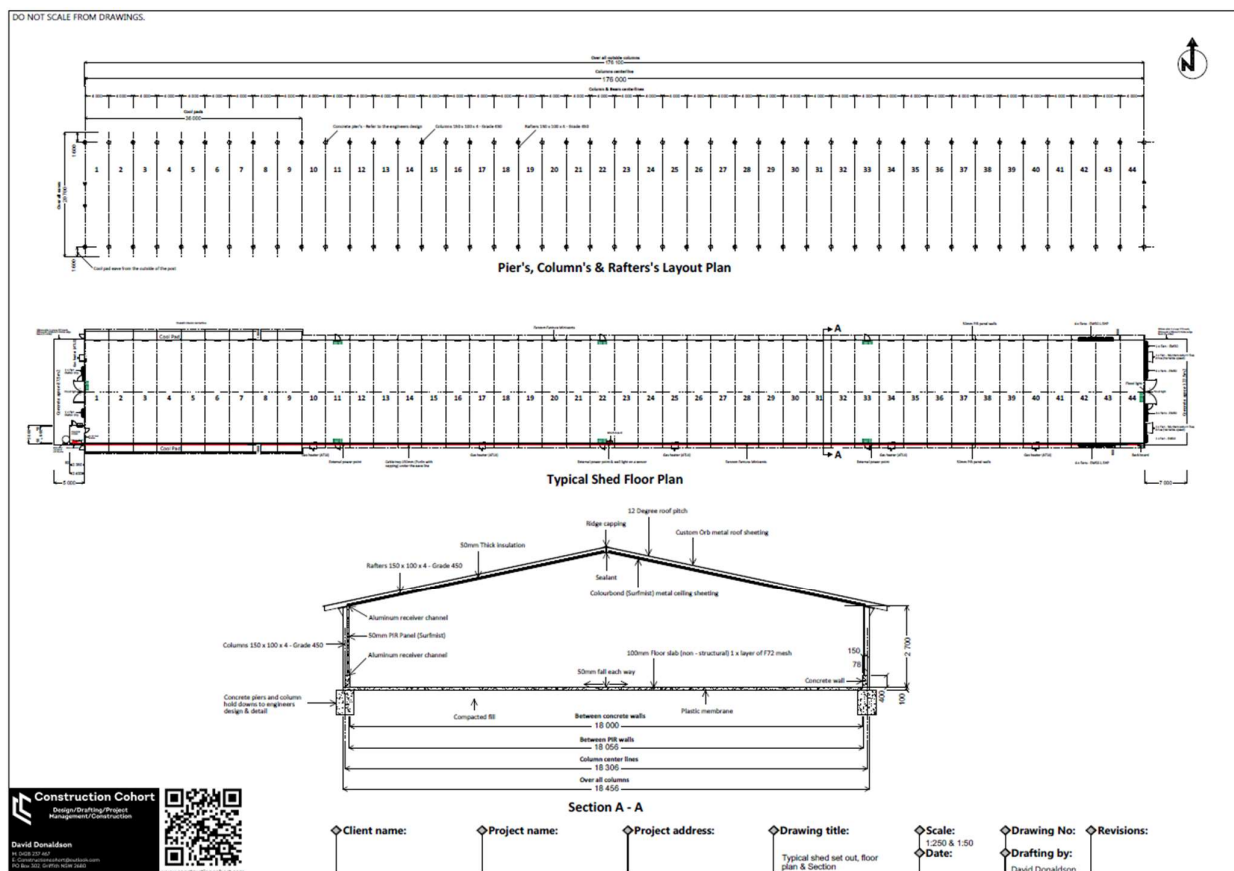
Modified Shed Plans (Construction Cohort, 2024)
